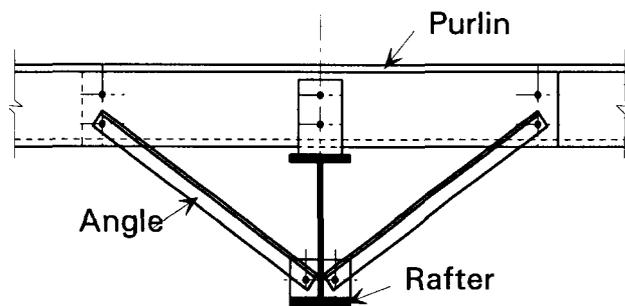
Bracing to locally restrain a member in a portal frame
